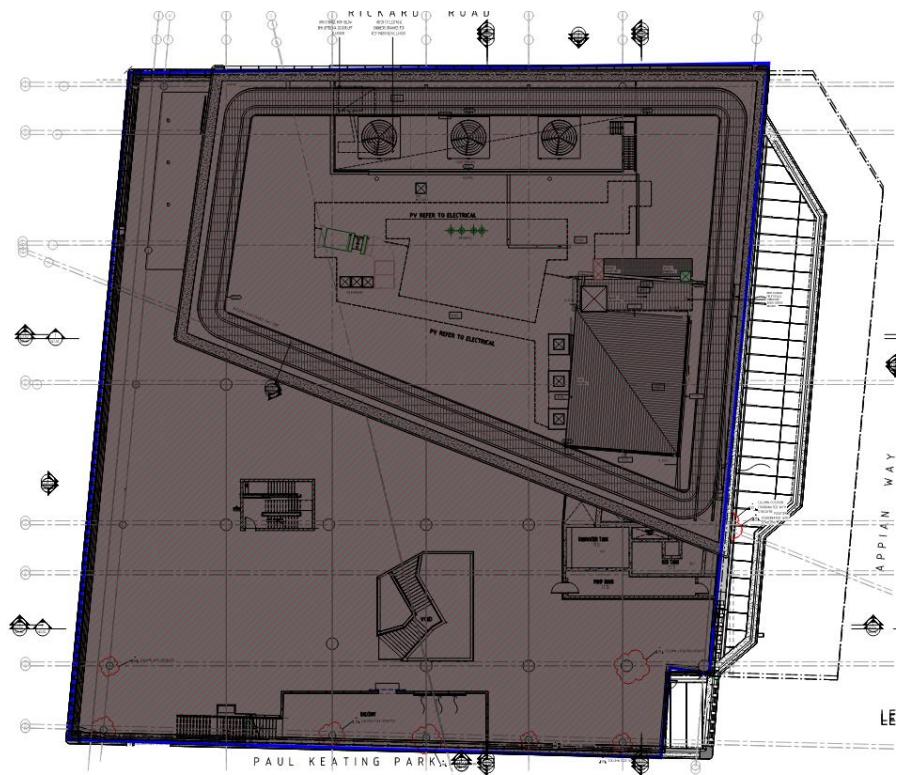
Combined Floor Plans for Roof Catchment (Lyons Architects dated 31/07/2020)
